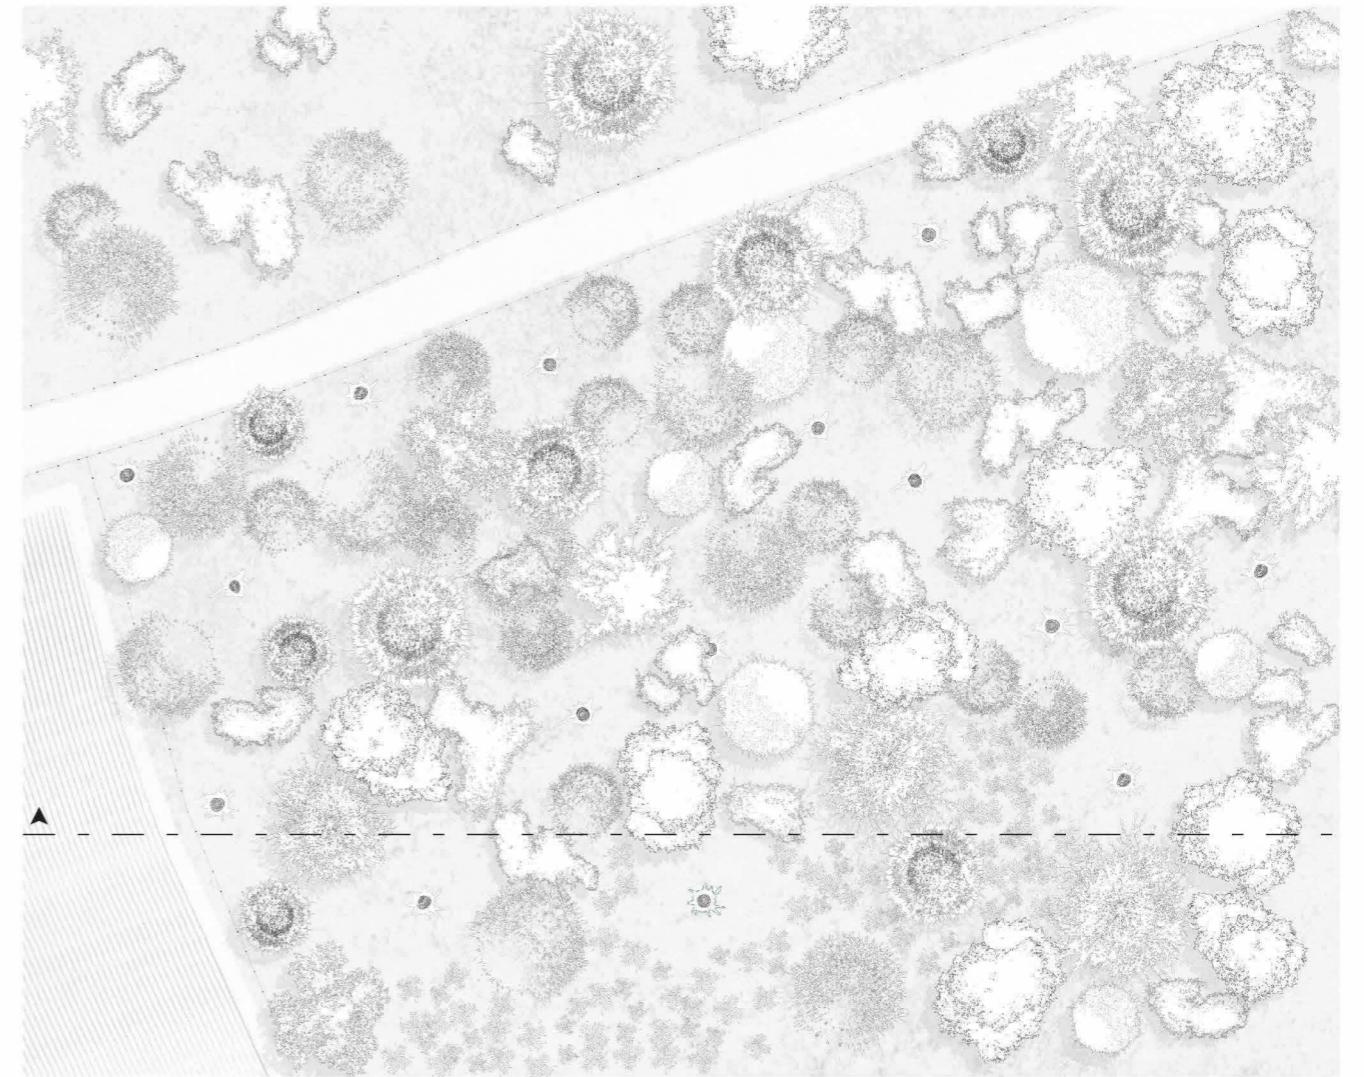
Plan after harvesting (Scale 1:200 - A0)
